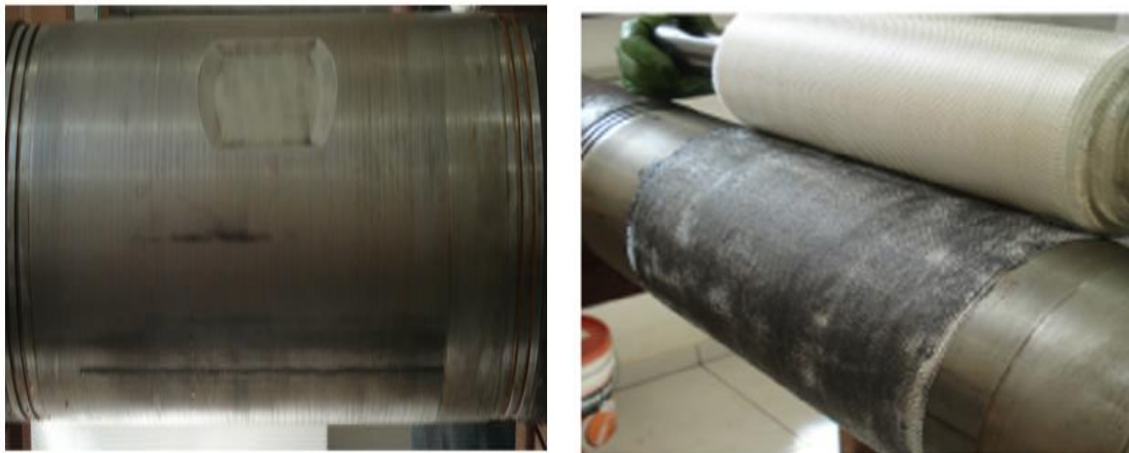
Specimen repair preparation of defect for hydrostatic testing [112].
